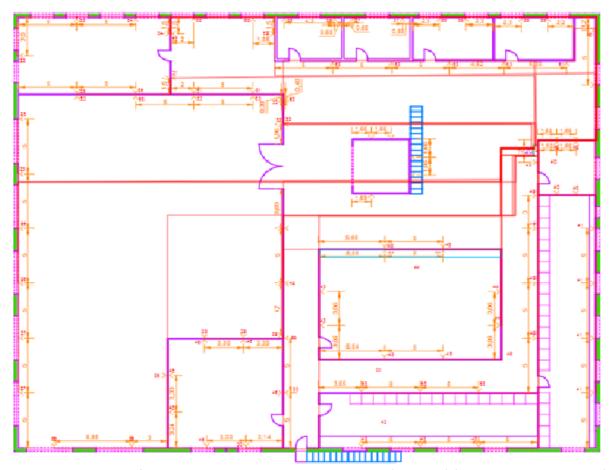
Installation of single-phase outlets on the building plan (example) (source: own elaboration)
